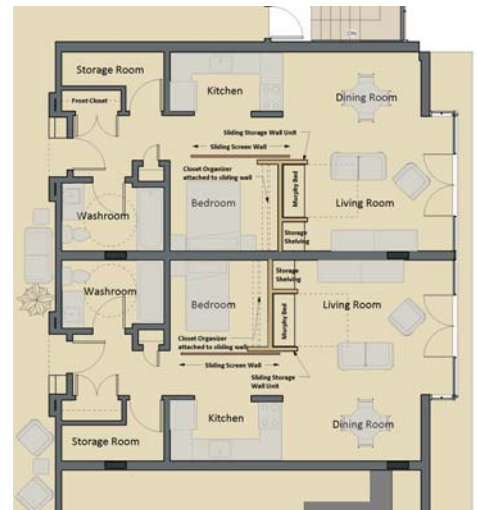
Loft Home Unit Plan - Showing Sliding Wall
